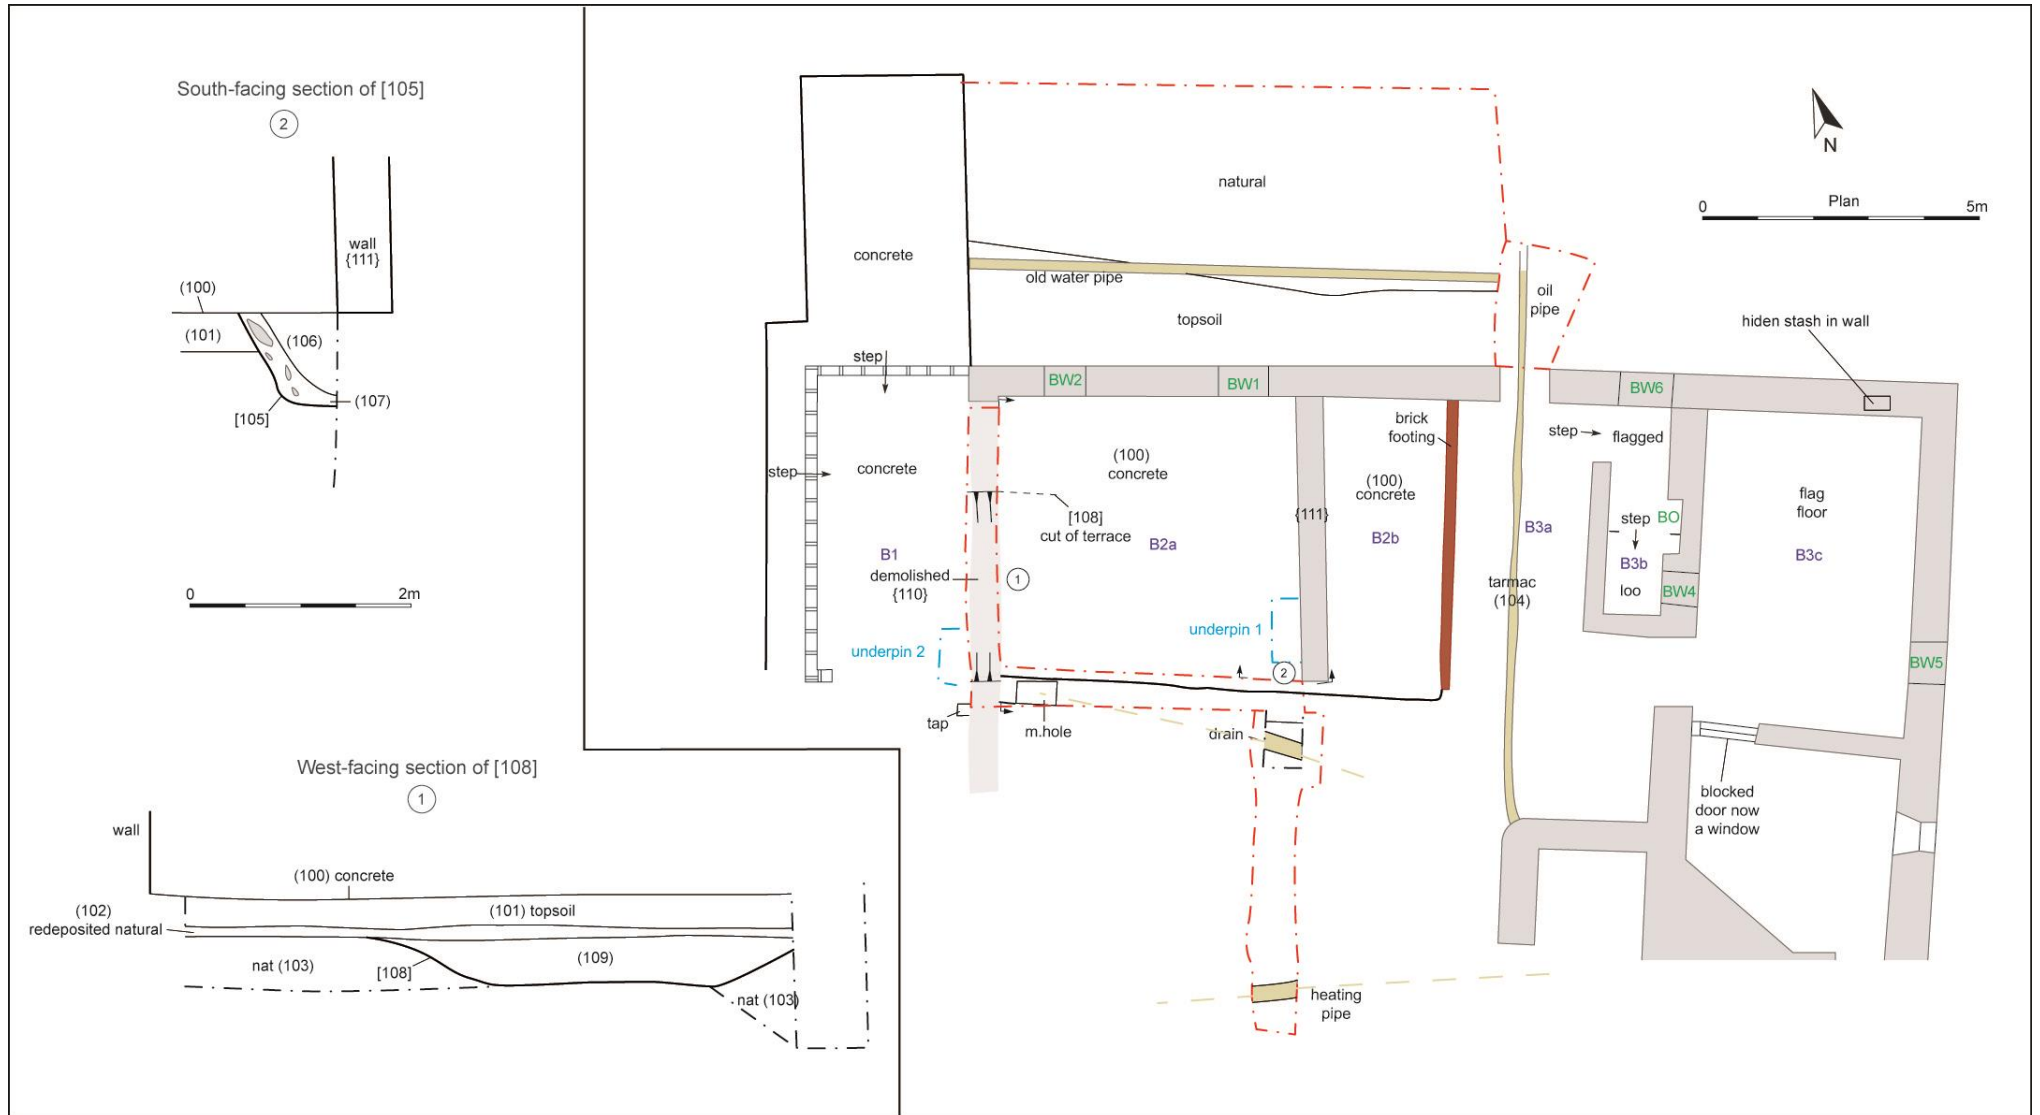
PLAN OF THE EXCAVATIONS/MONITORED AREAS (BASED ON ARCHITECTS PLANS).
